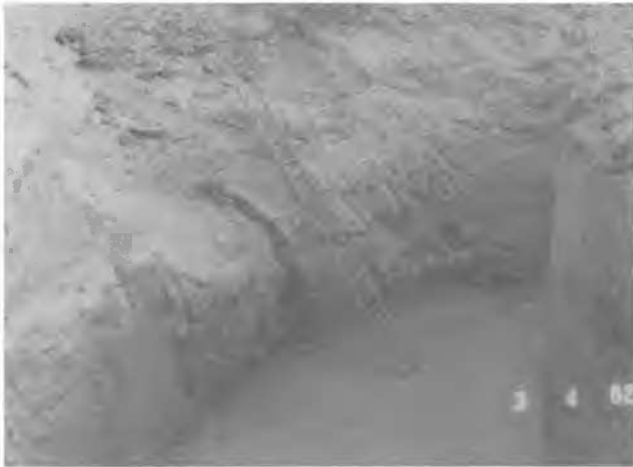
Excavation of the annular trench for the chimney foundation on calcereous sandstone
